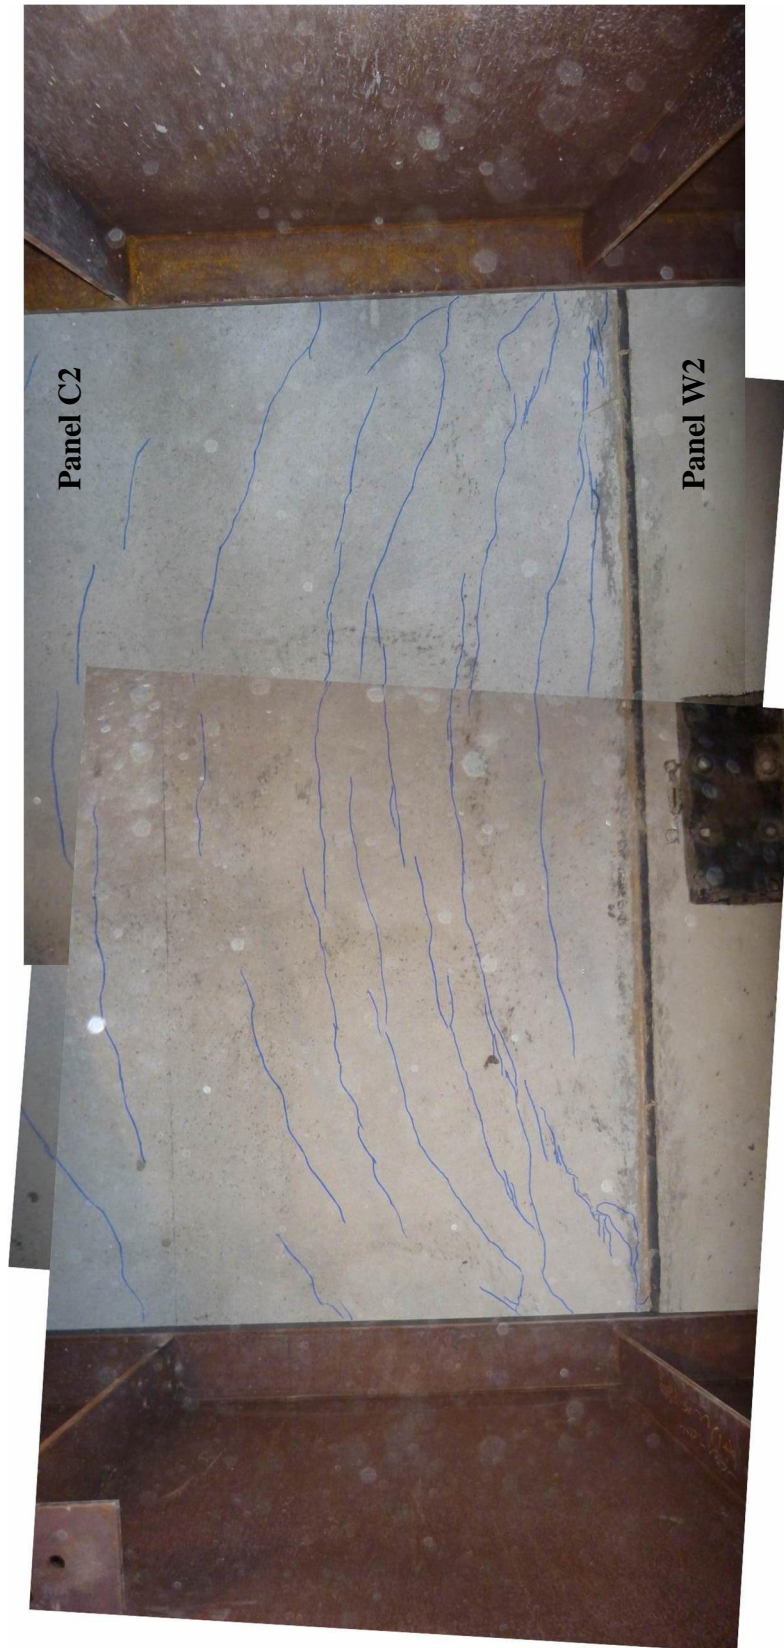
Cracks on Deck Soffit Between Girders (Test #3)
